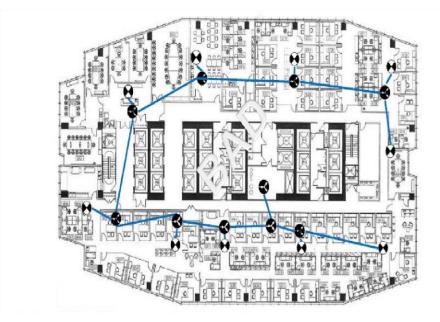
Decentralized horizontal (floor) plan spreads power dividers and increases test time
